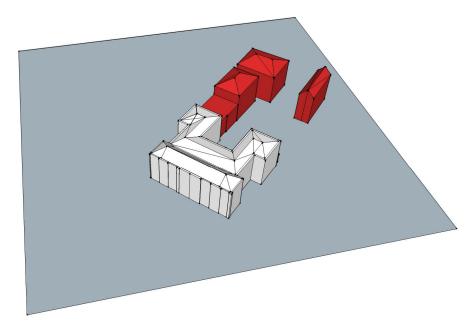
THREE BUILDING PARTS ARE ADDED: THE ZUSTERHUIS THAT CONNECTS TO THE NORTH WING IN 1872 AND THE SEPARATE ZUSTERHUIS IN 1882, BOTH BY ARCHITECT G.B. SALM. ON THE SOUTH WING, AN OPERATING ROOM IS ADDED FACING THE GARDEN, IN 1886 (ARCHITECT UNKNOWN). ILLUSTRATION BY AUTHOR.
